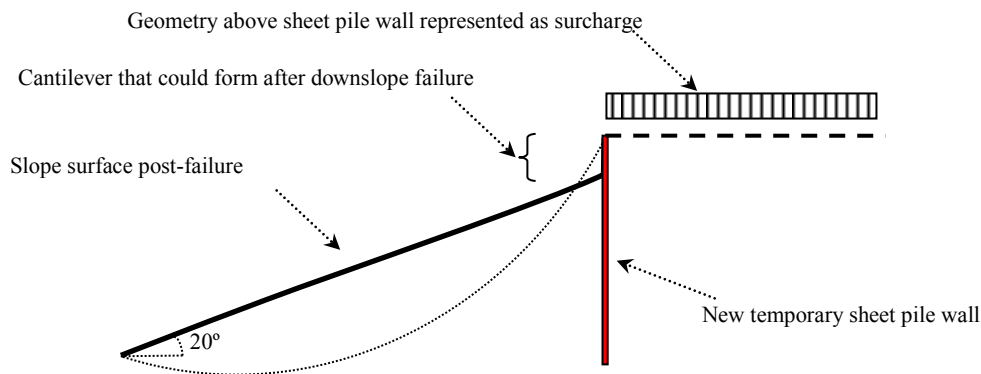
Simplified temporary sheet pile wall model adopted in WALLAP
